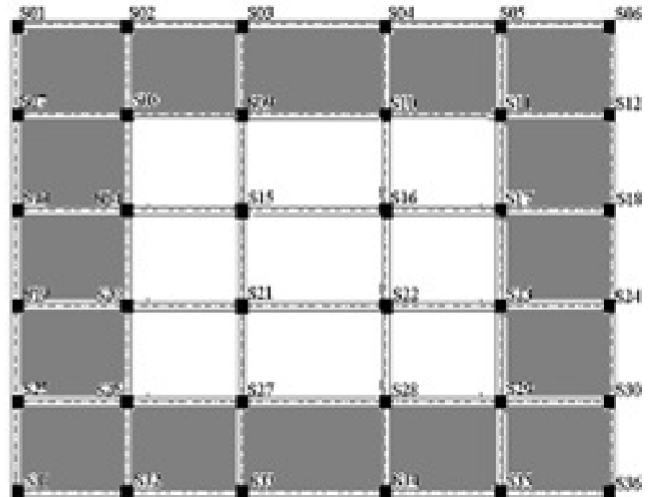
The storey plans and gaps of B1, B2 and B3 buildings.
